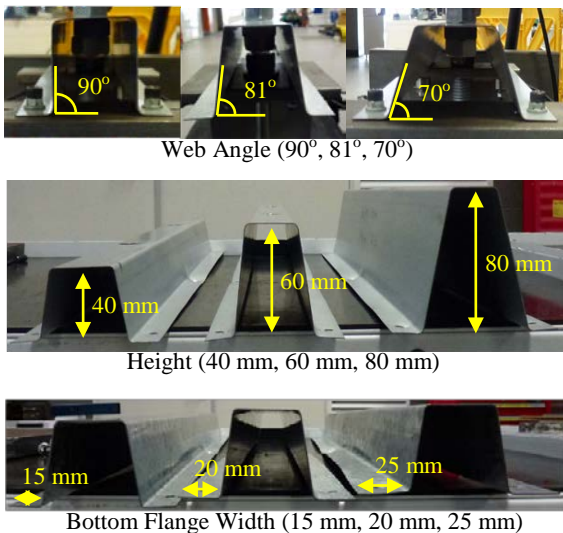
Main Roof Batten Test Specimens (Sivapathasundaram and Mahendran, 2014)
